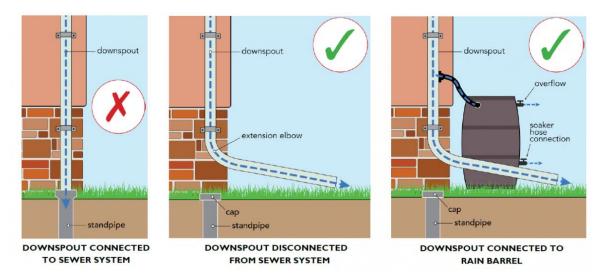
Process of disconnecting the downspout from a pipe or the paved area (EPA, 2022)
